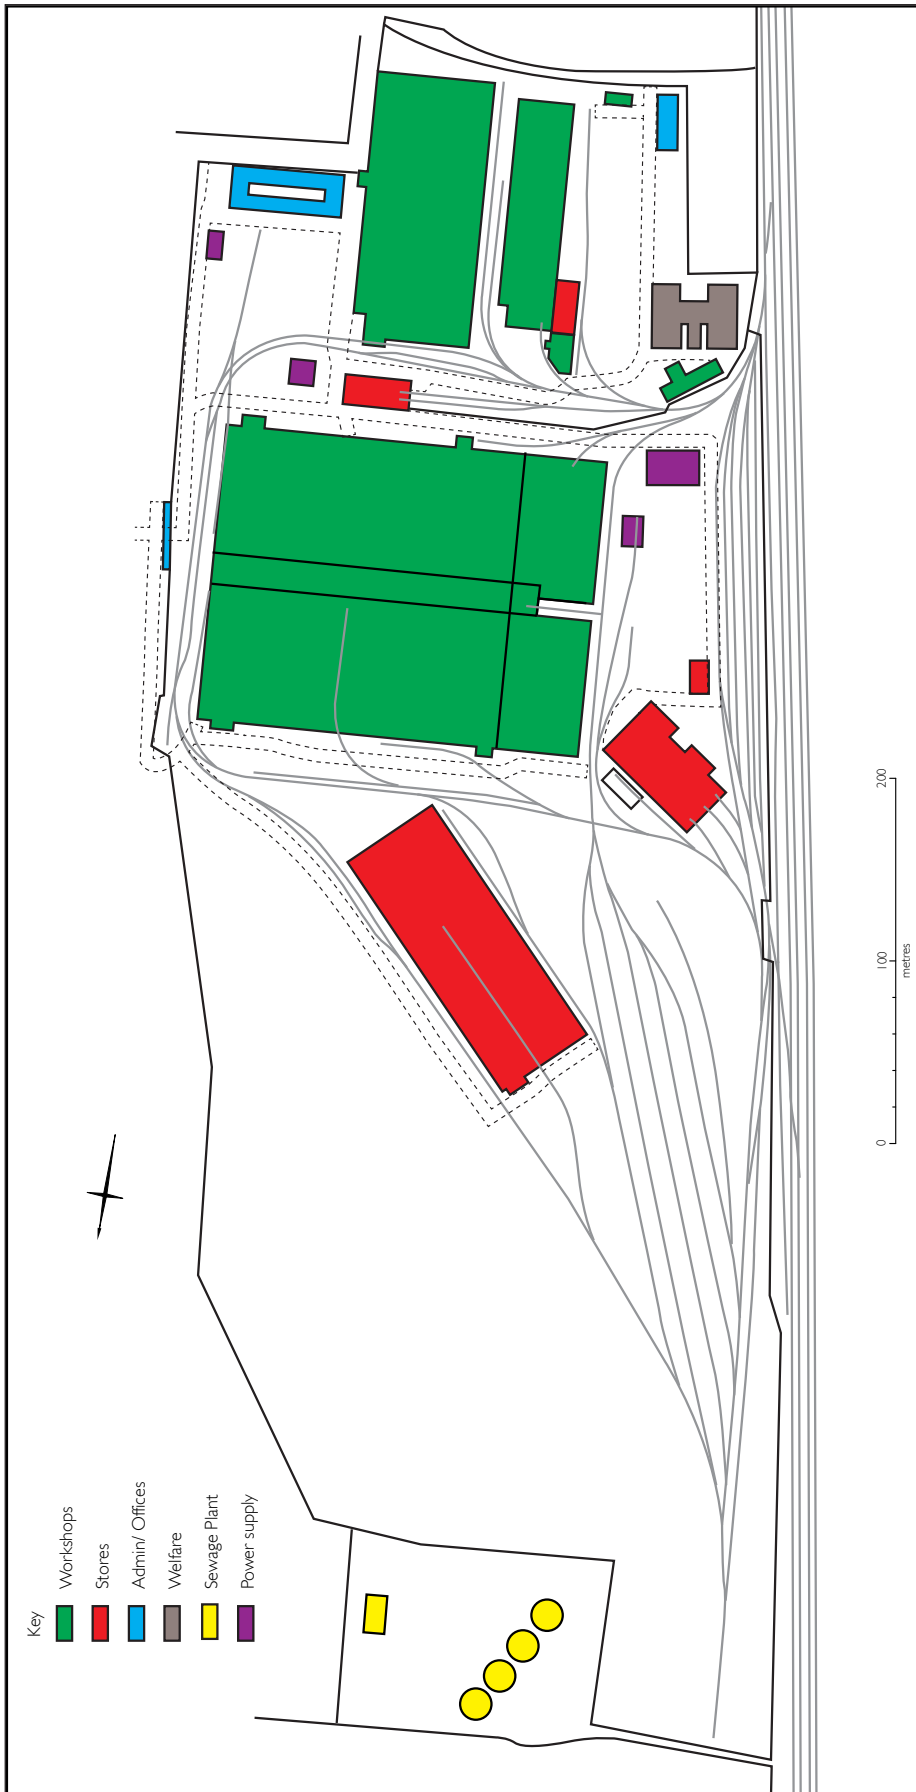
N.P.F. Birtley, plan, 1918 (redrawn from TNA MUN5/157).
